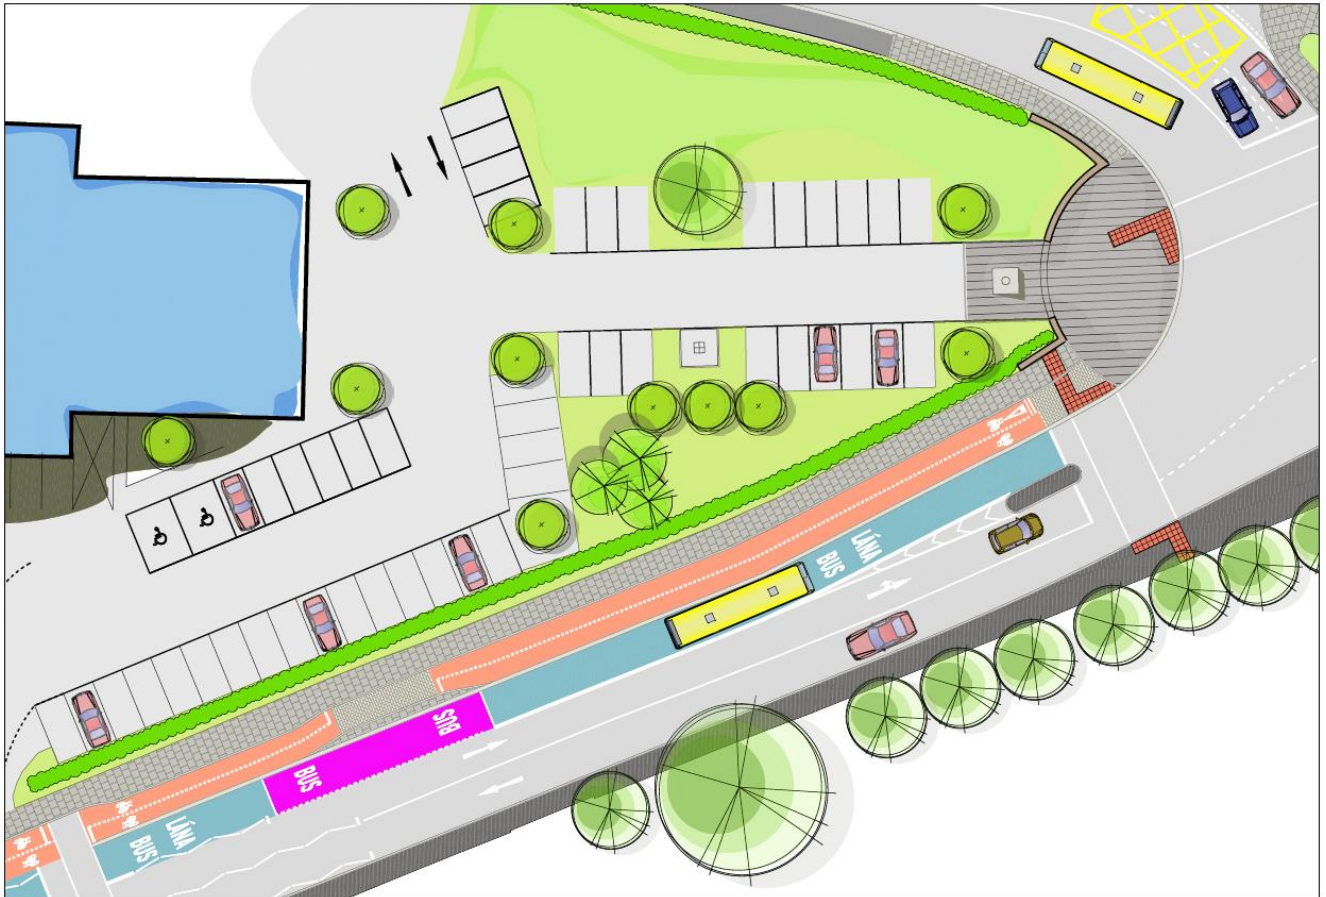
St Anne's Church Grounds Reinstatement Proposal
